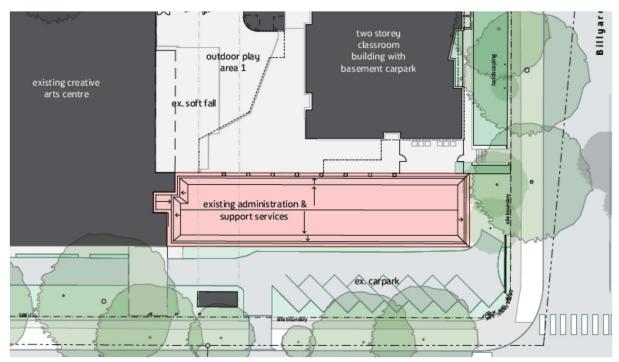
Excerpt of site plan showing existing school blocks/buildings in relation to the proposed development area.
